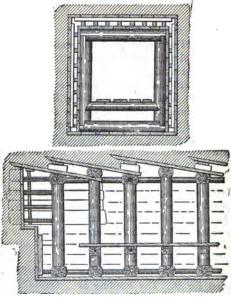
TIMBERING FOR TUNNEL HEADING.
